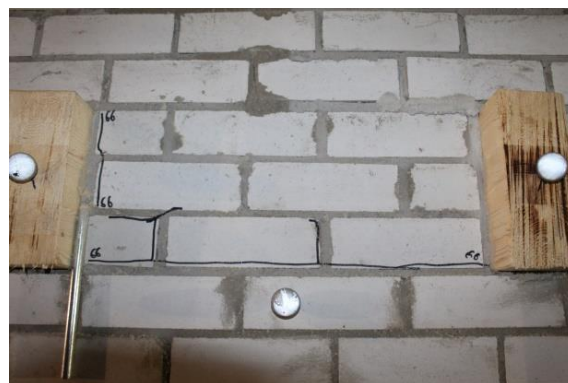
EQ-NPR 66% cracks – North clay façade.
